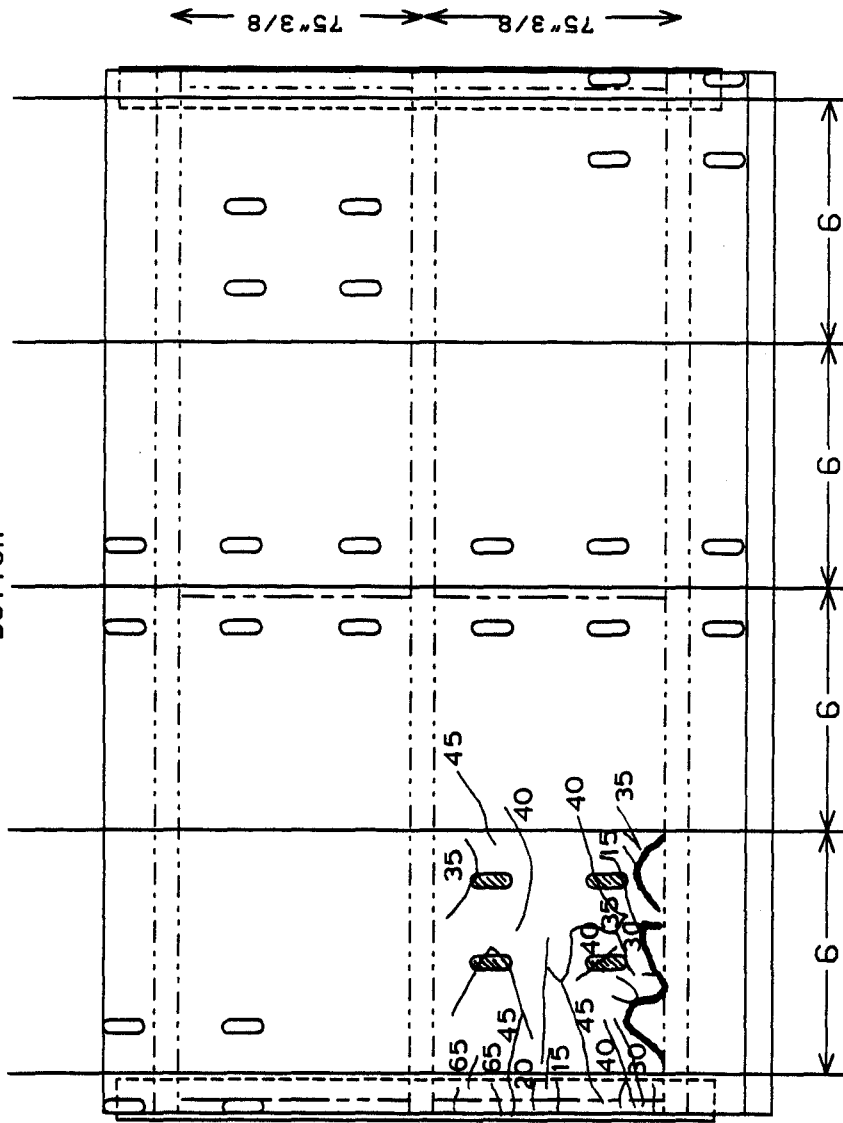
Bottom Cracking Pattern (Second Bridge - Test No. 6)
